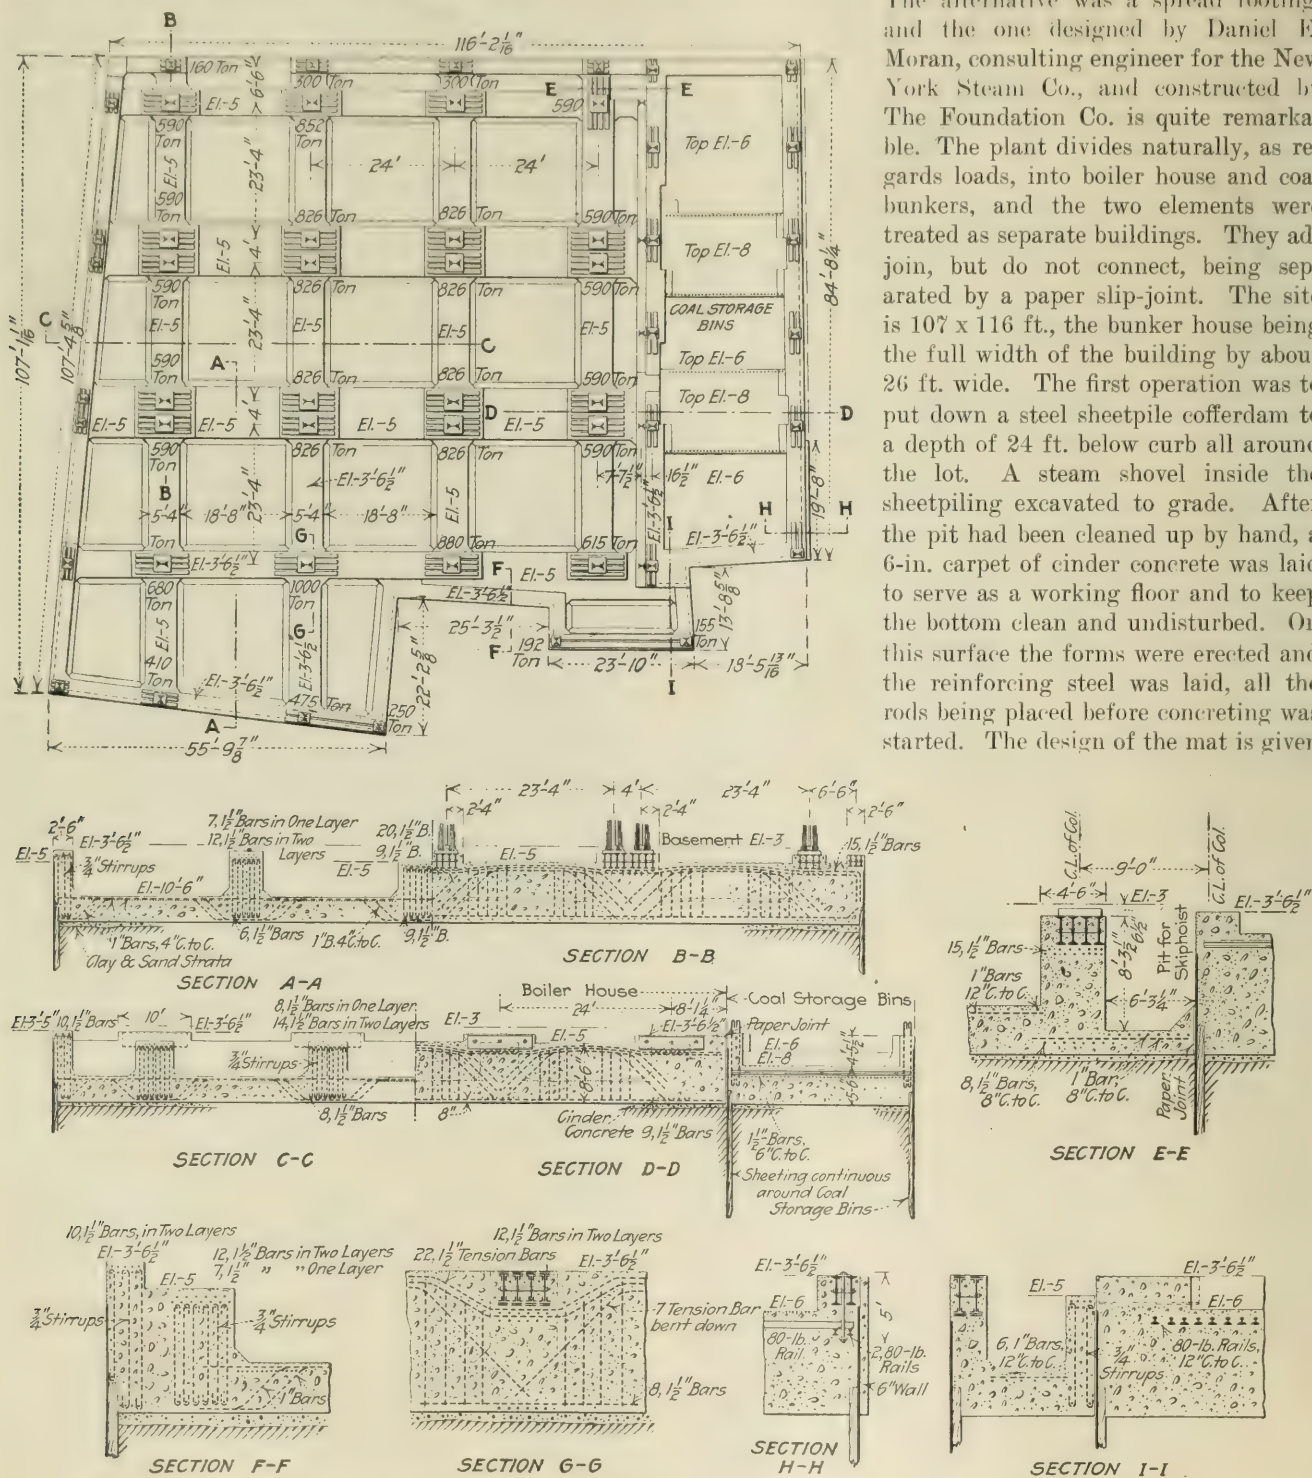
PLAN AND DETAILS OF CONCRETE MAT UNDER NEW YORK STEAM PLANT
